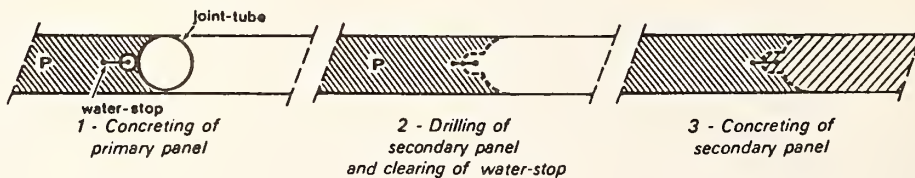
Alternate methods for sealing diaphragm wall panels (57).
